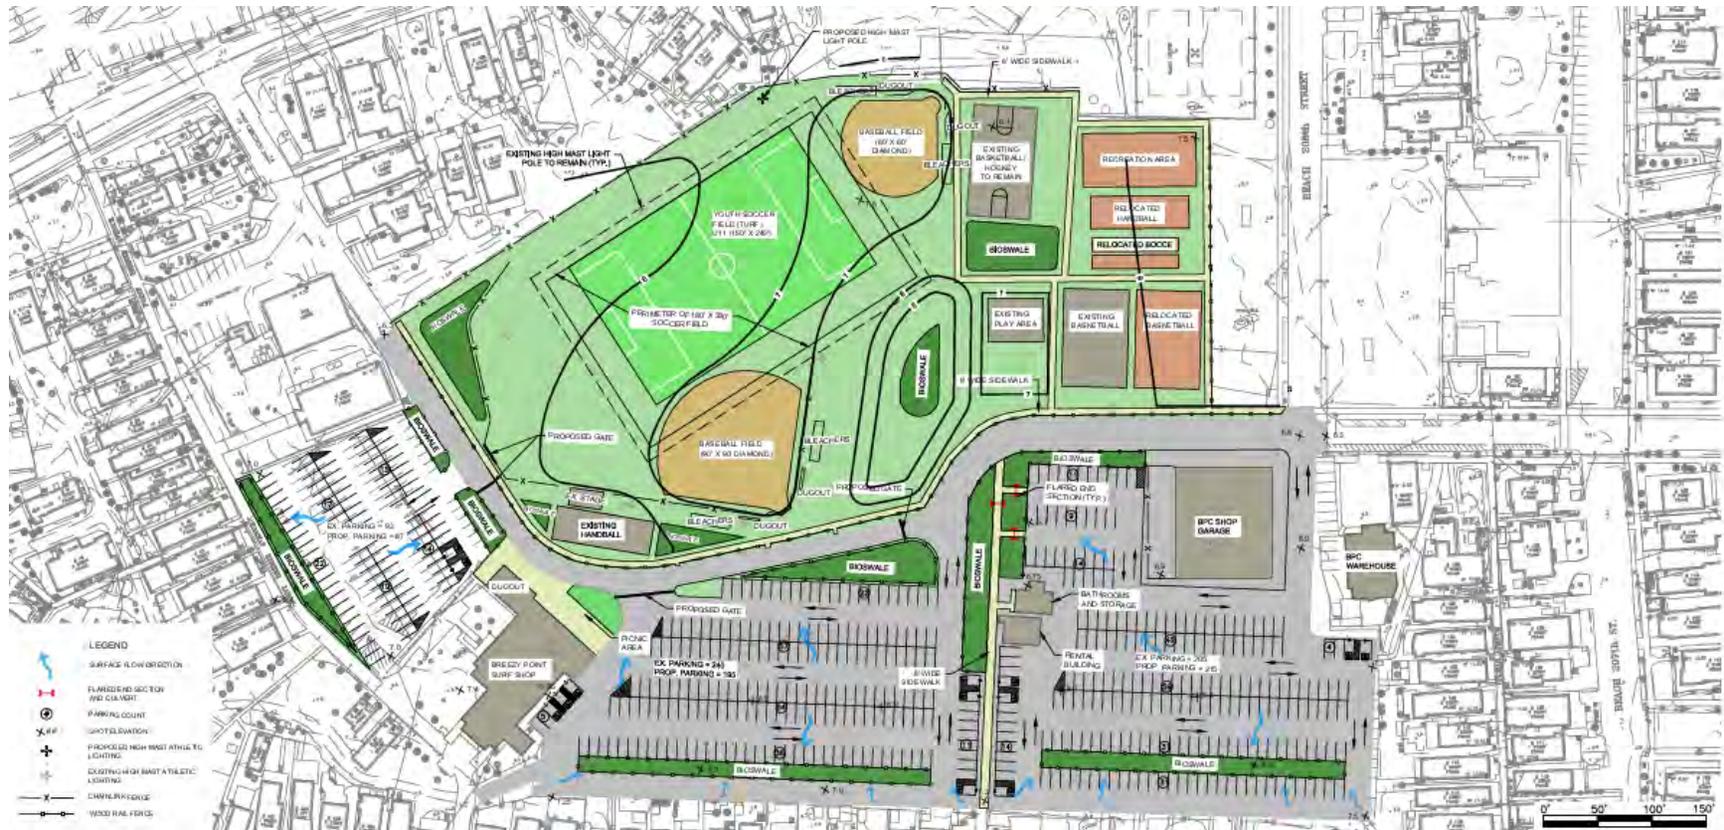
Breezy Point Ballfields Proposed Site Plan
